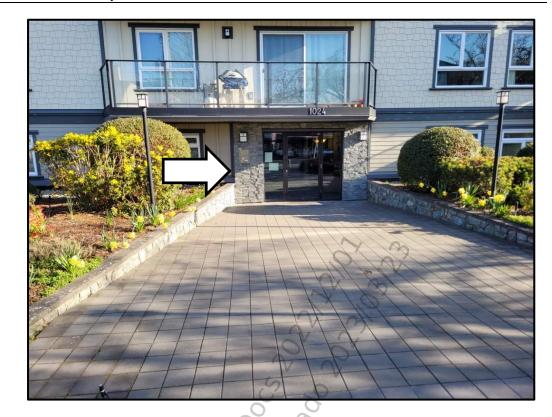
(B20 10 00.03) - Stone Veneer Cladding around Front Entrance
